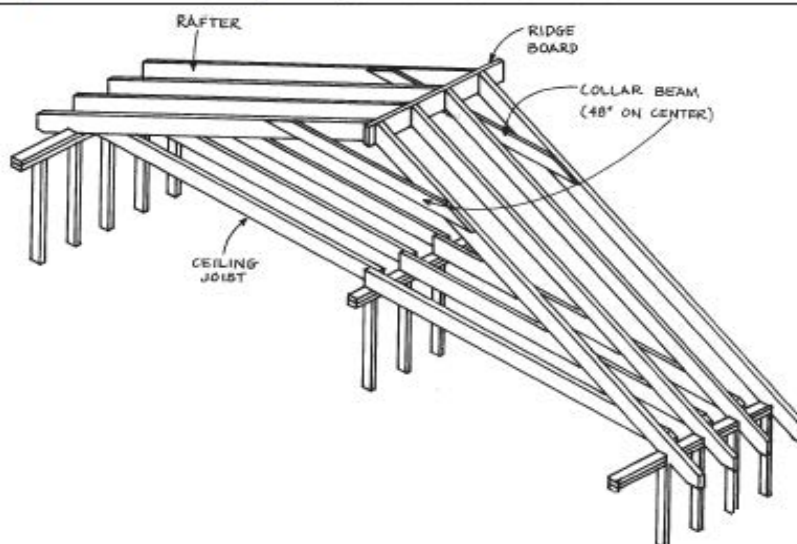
Roof Framing Ceiling Joists Parallel to Rafters
